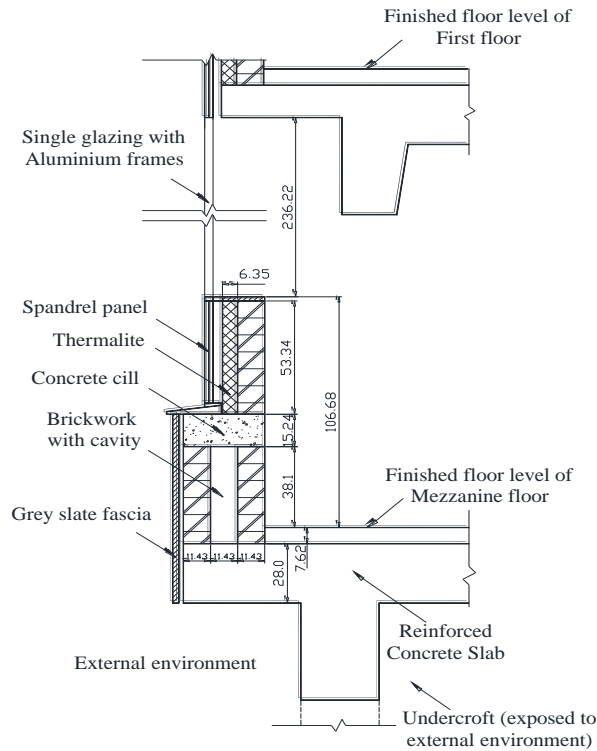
Cross section of the façade for the Mezzanine floor. (Unit: cm)
